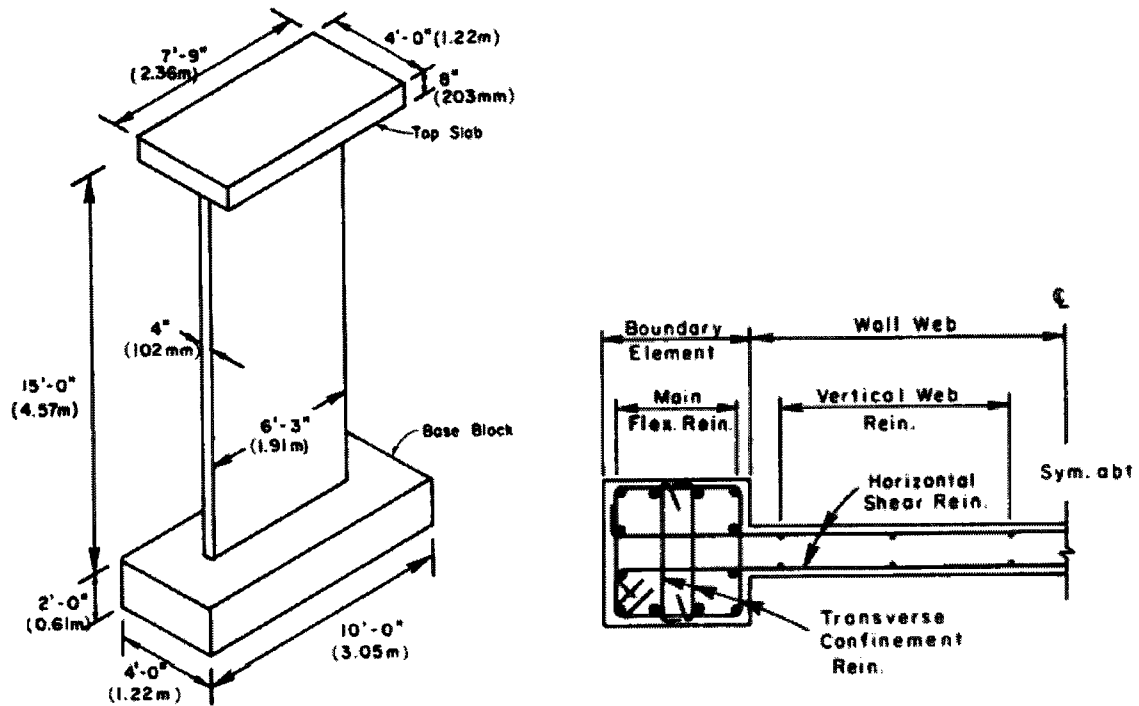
Nominal Test Specimens; PCA Walls (Fiorato et al., 1983)
